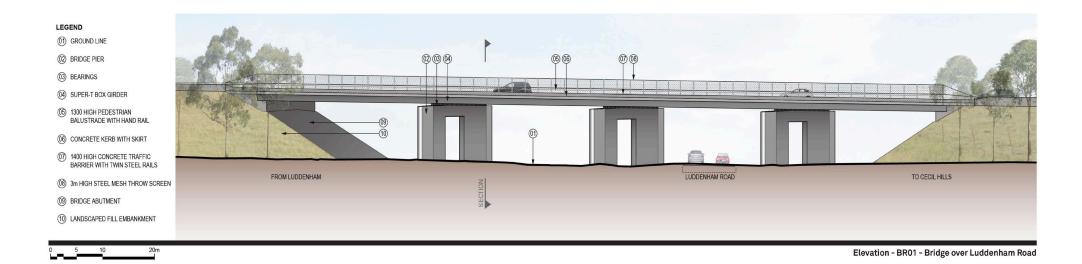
Indicative cross section and image of BR01 and similar structures BR09, BR10, BR13, BR17 and BR18
